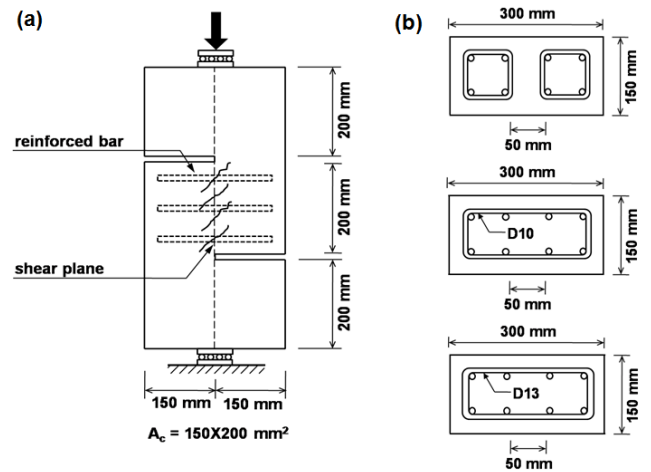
Specimen geometries for tests; (a) test specimen with transverse reinforcements, (b) specimen dimension and arrangement of reinforcements at cross section
